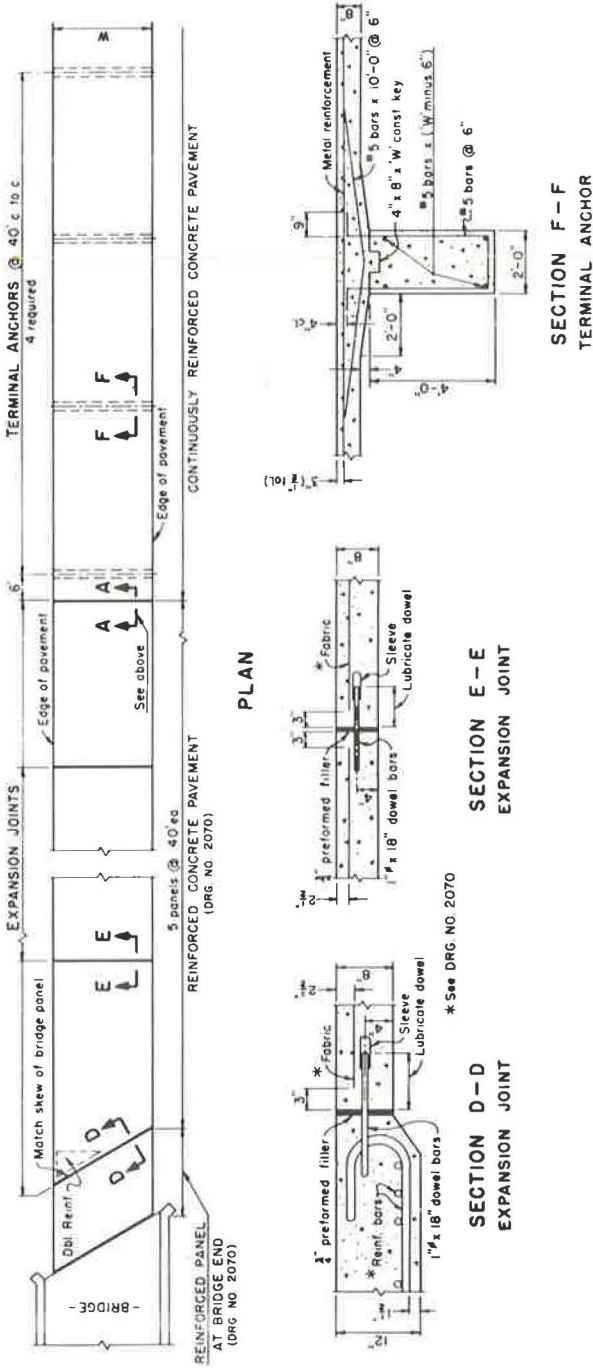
Continuously-reinforced pavement; metal reinforcement lapping details.
